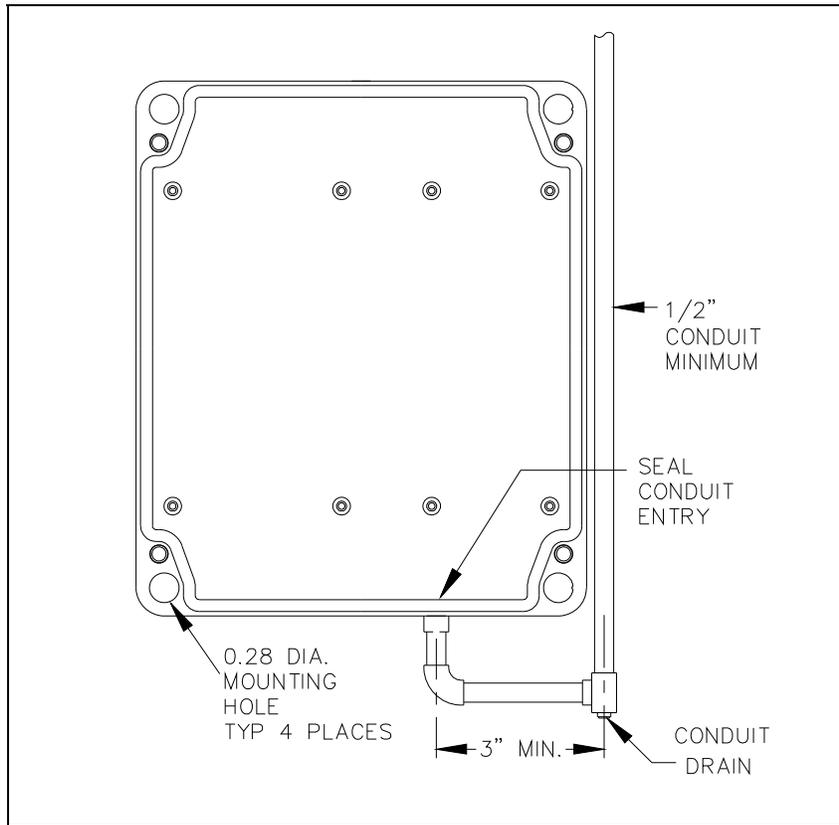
Bottom entry conduit installation details (RECOMMENDED for non-metallic enclosures)
